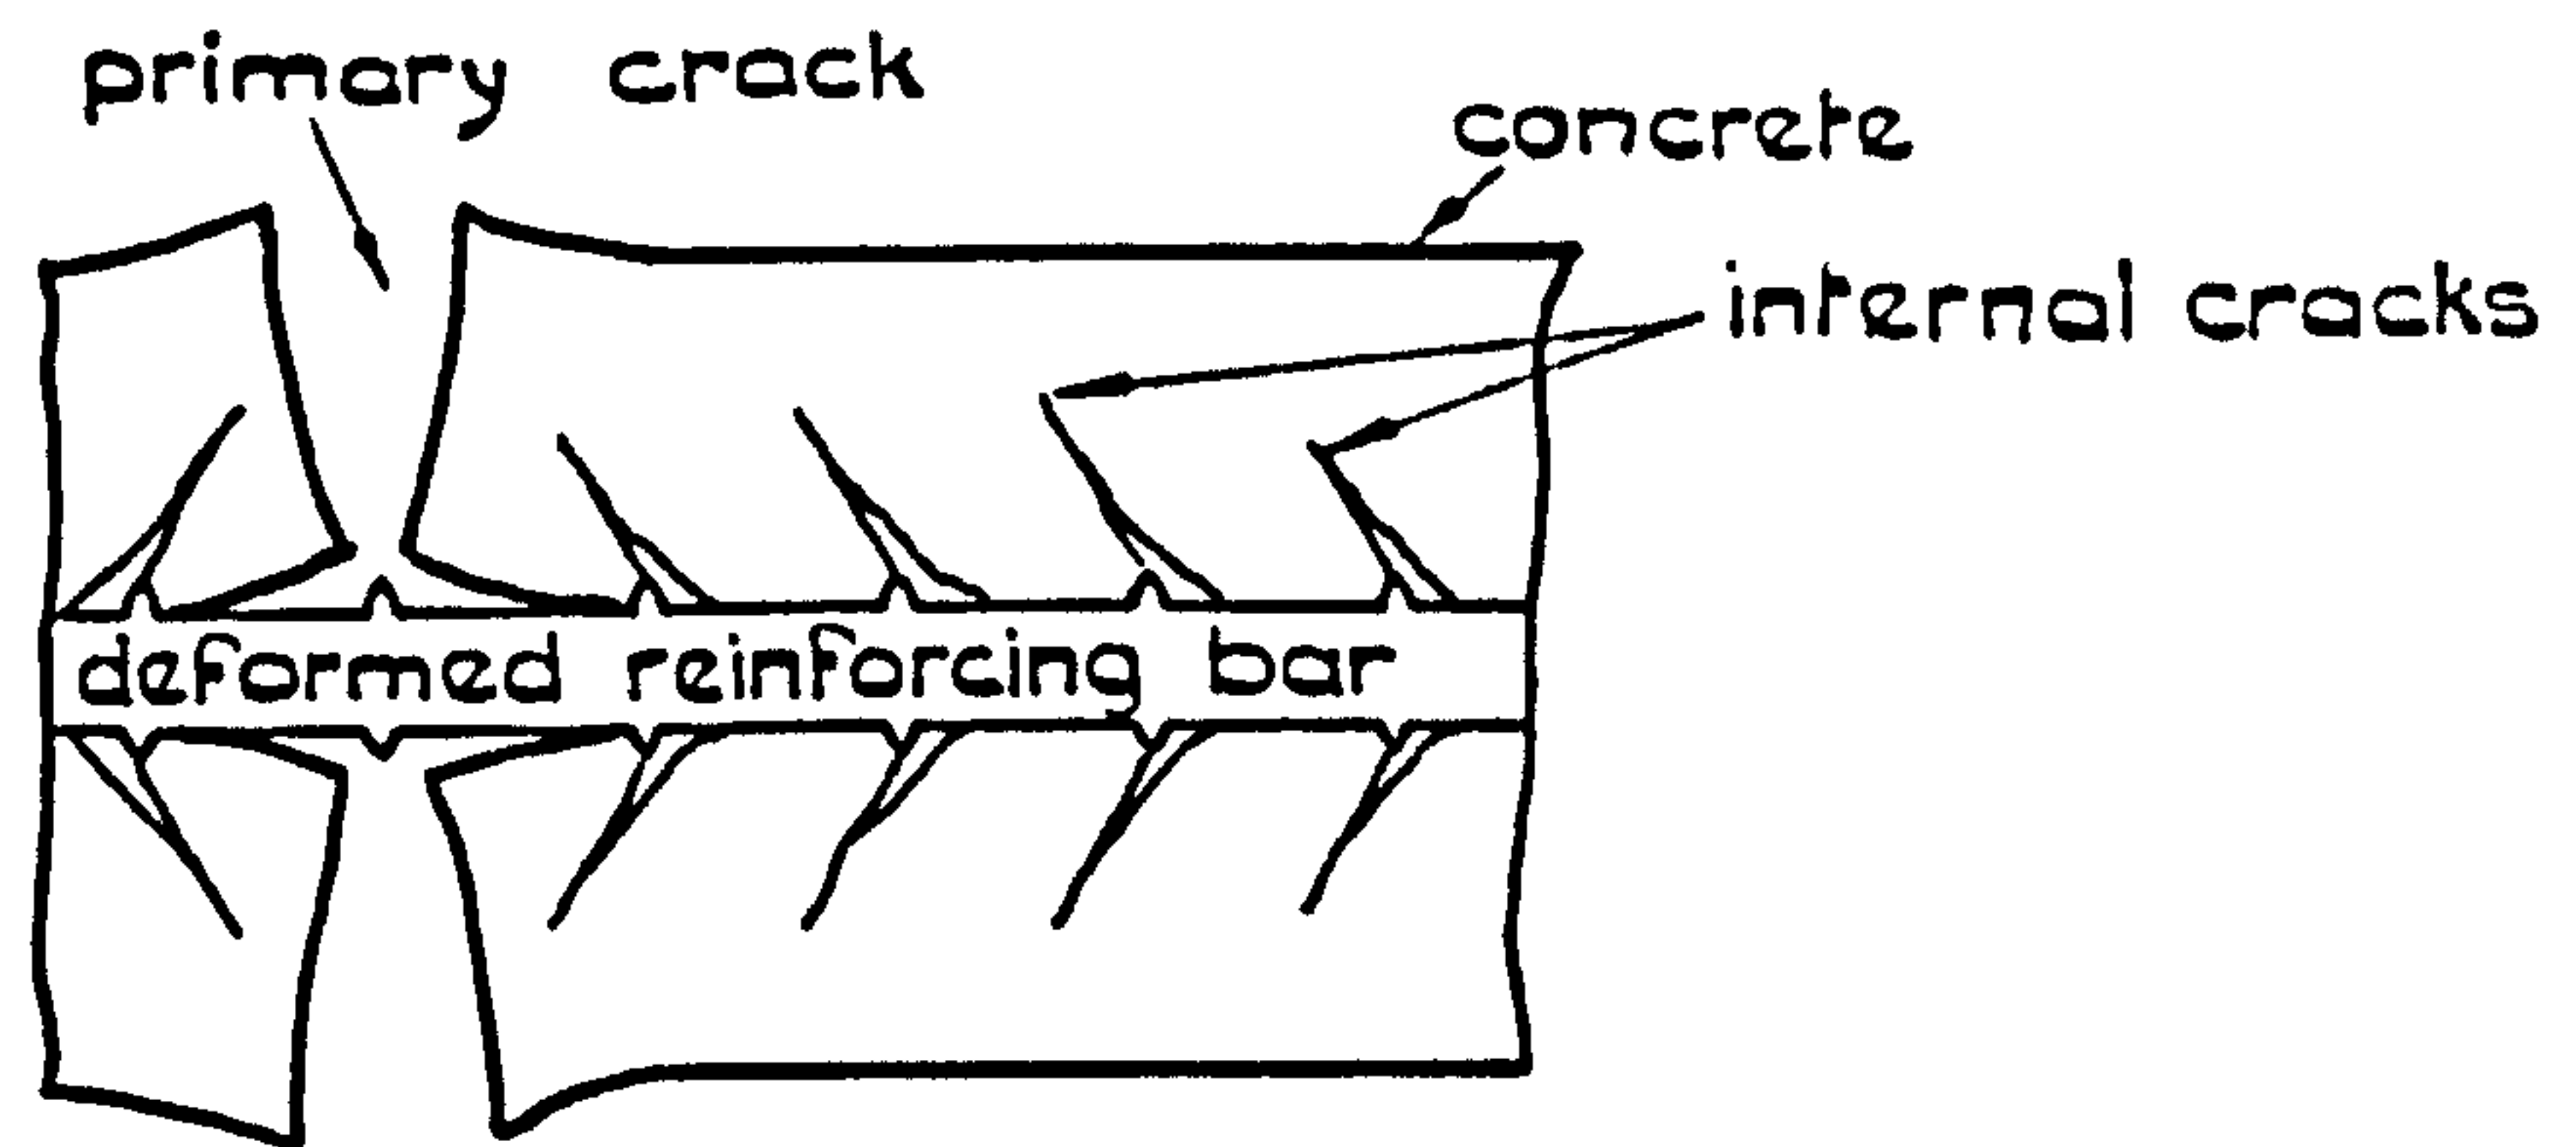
INTERNAL CRACKING IN REINFORCED CONCRETE PRISM
